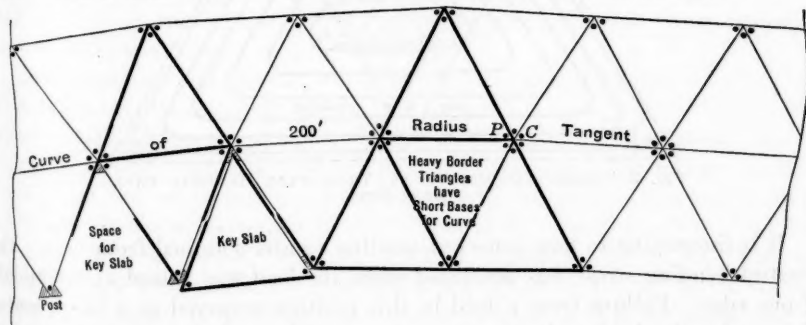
TRIANGLE HIGHWAY PAVEMENT, ASSEMBLY OF SLABS.
